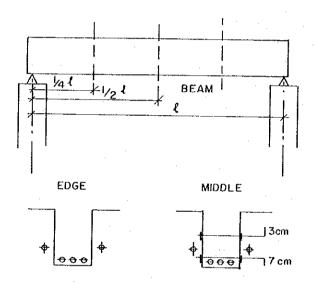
Setting Point of Strain Gauge (RC Bridge)
